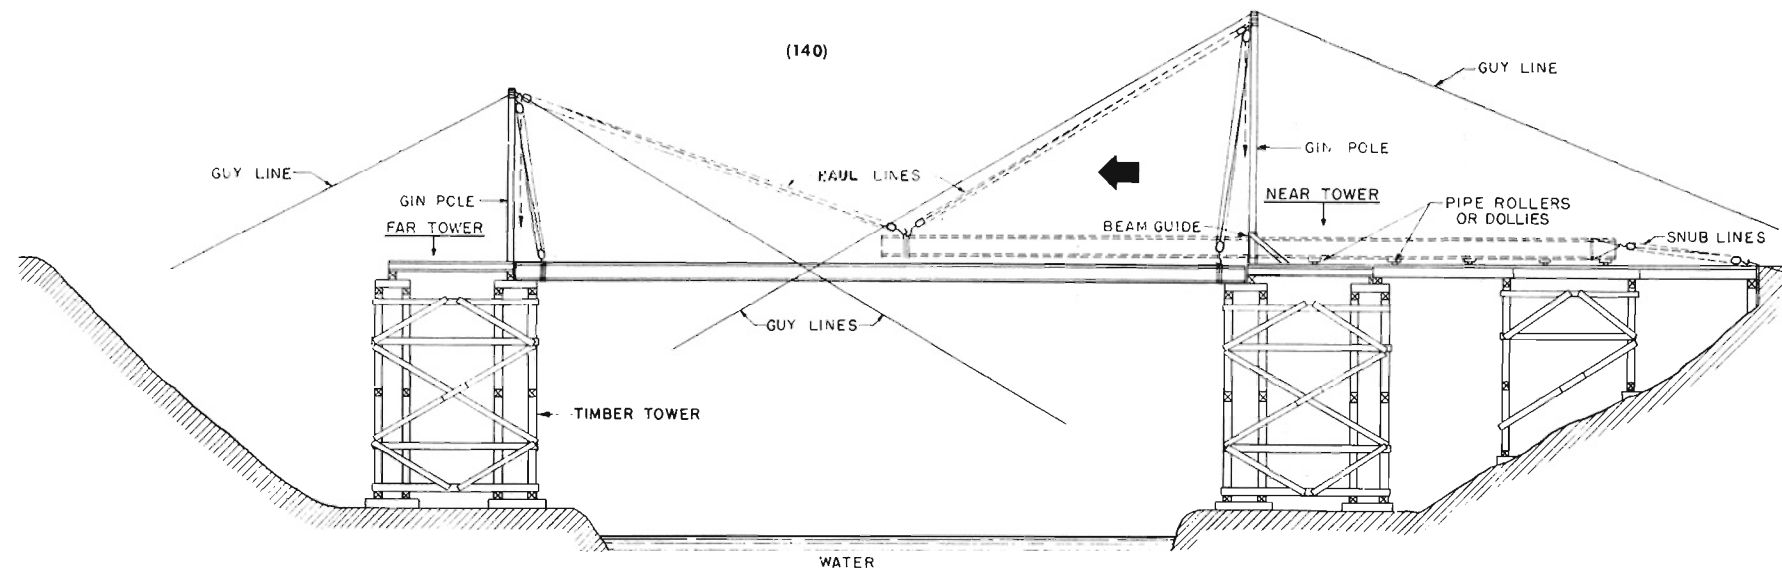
Launching steel stringers with gin poles. Gin poles on timber towers must be guyed to ground.
